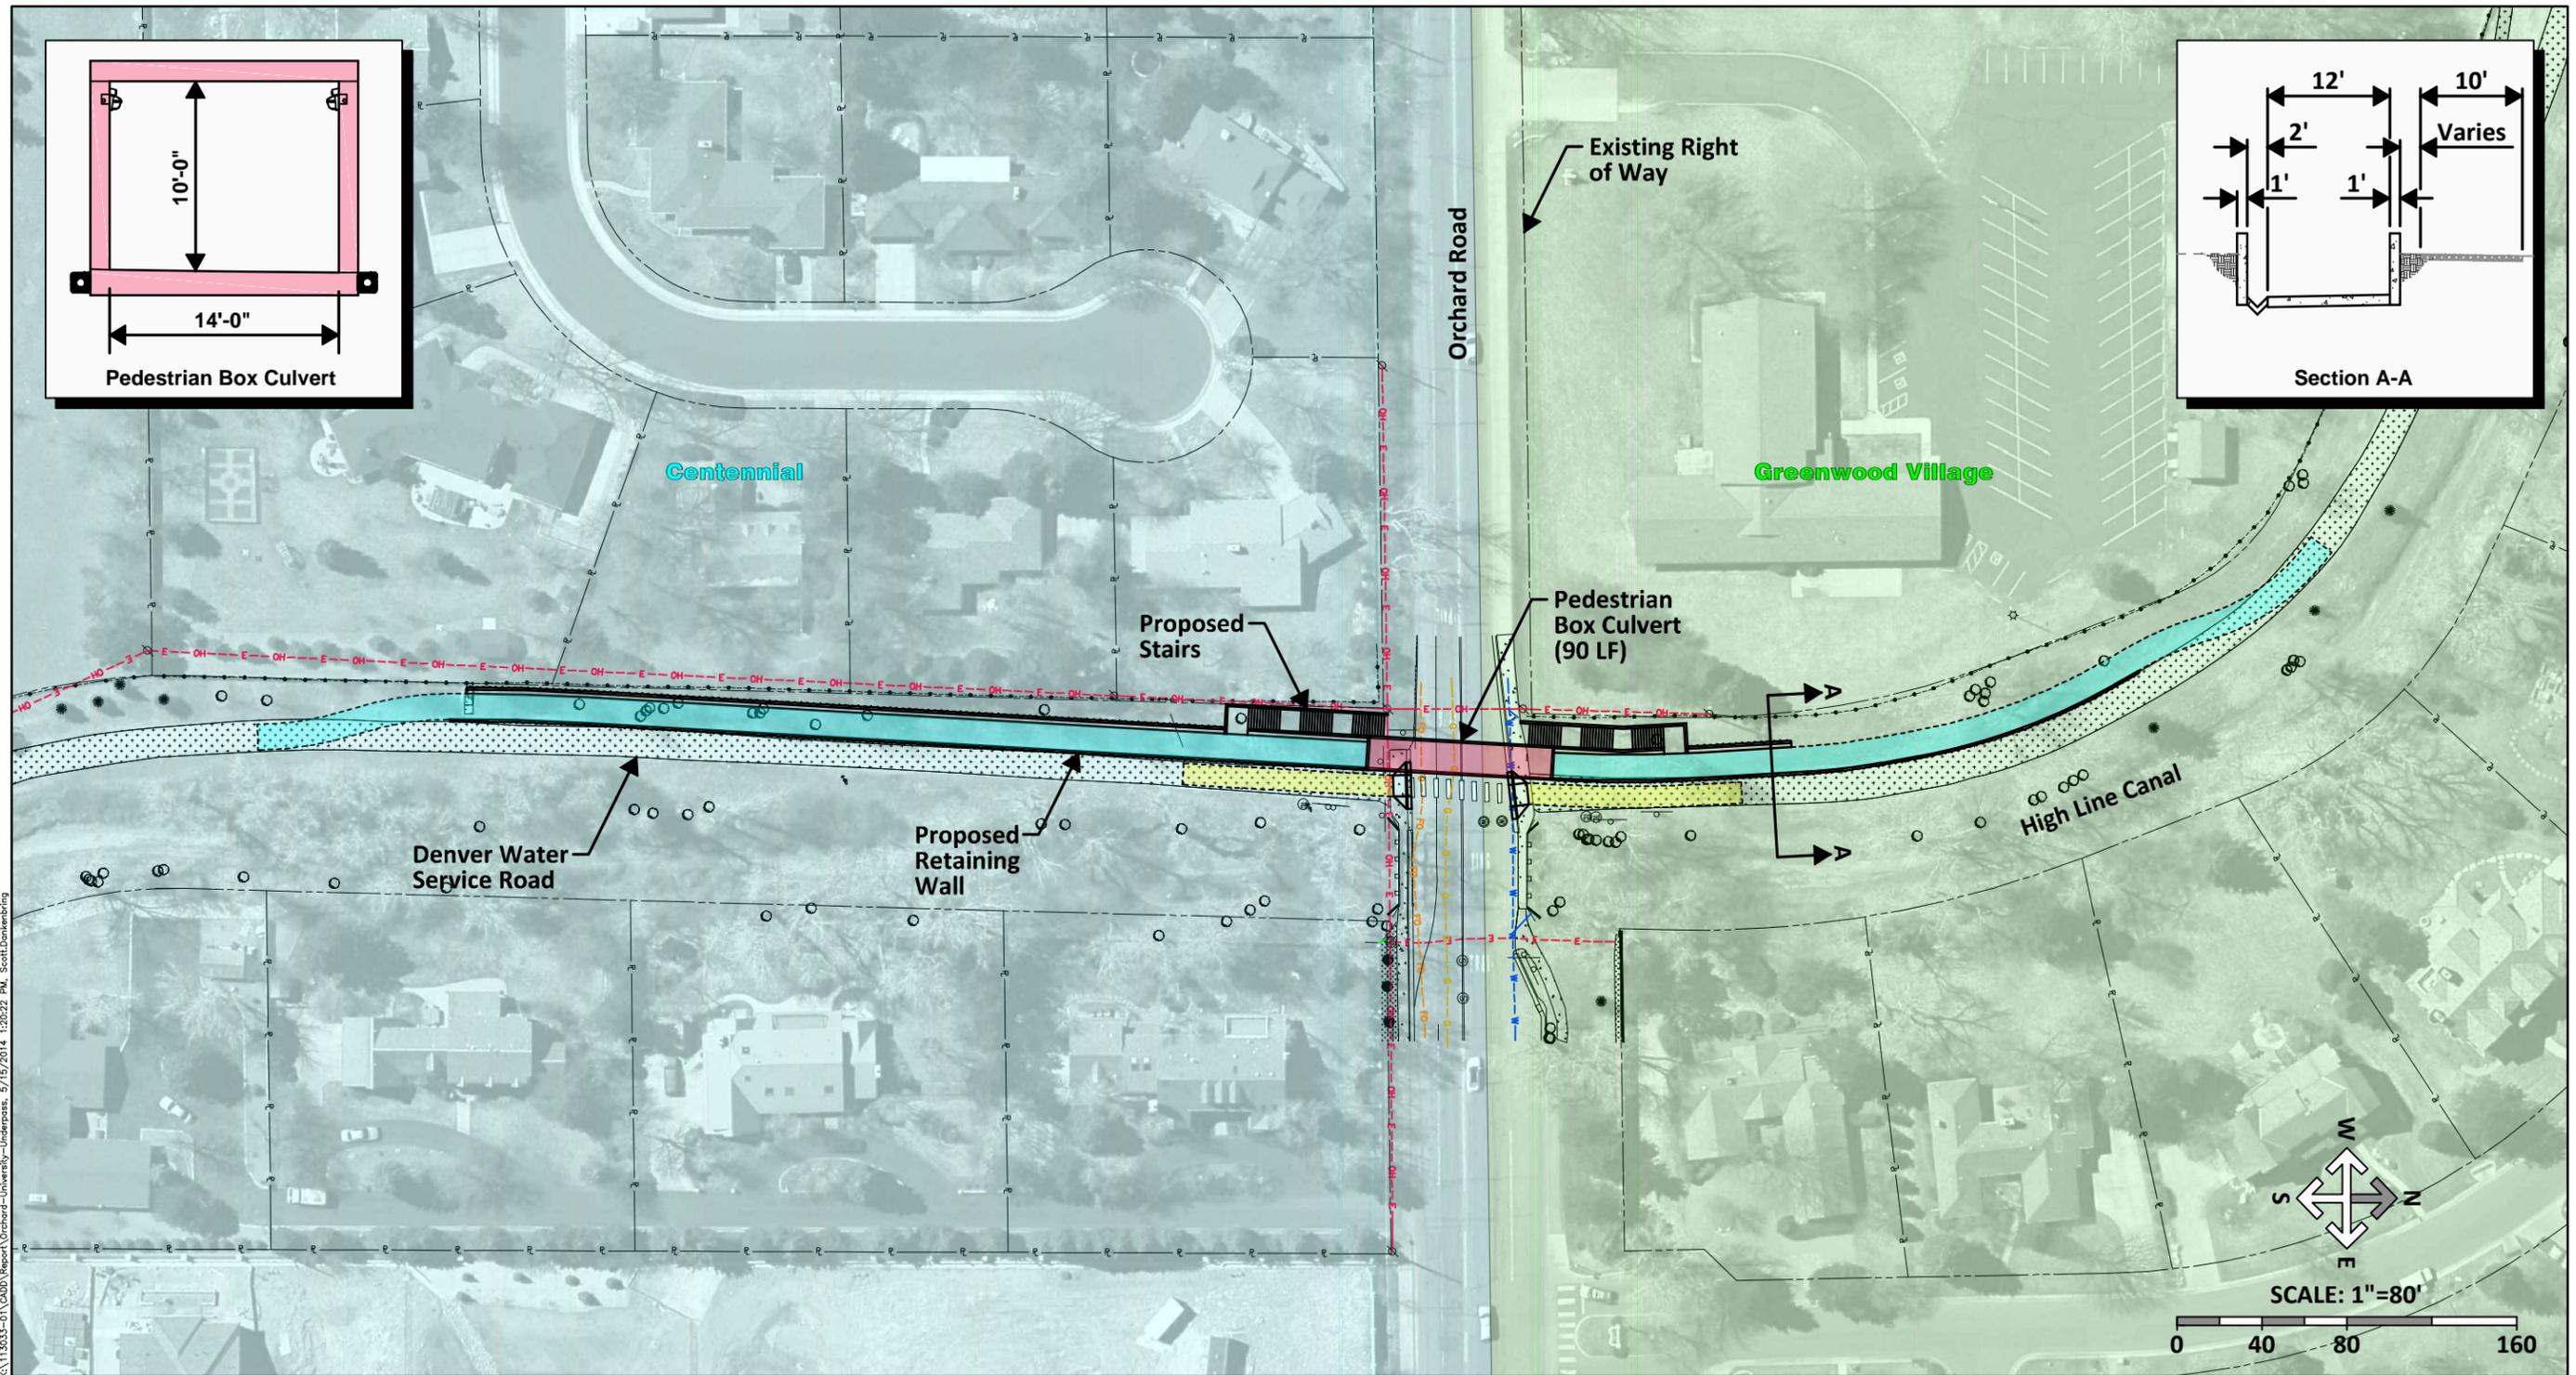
Orchard Road Crossing west of University Boulevard Underpass
